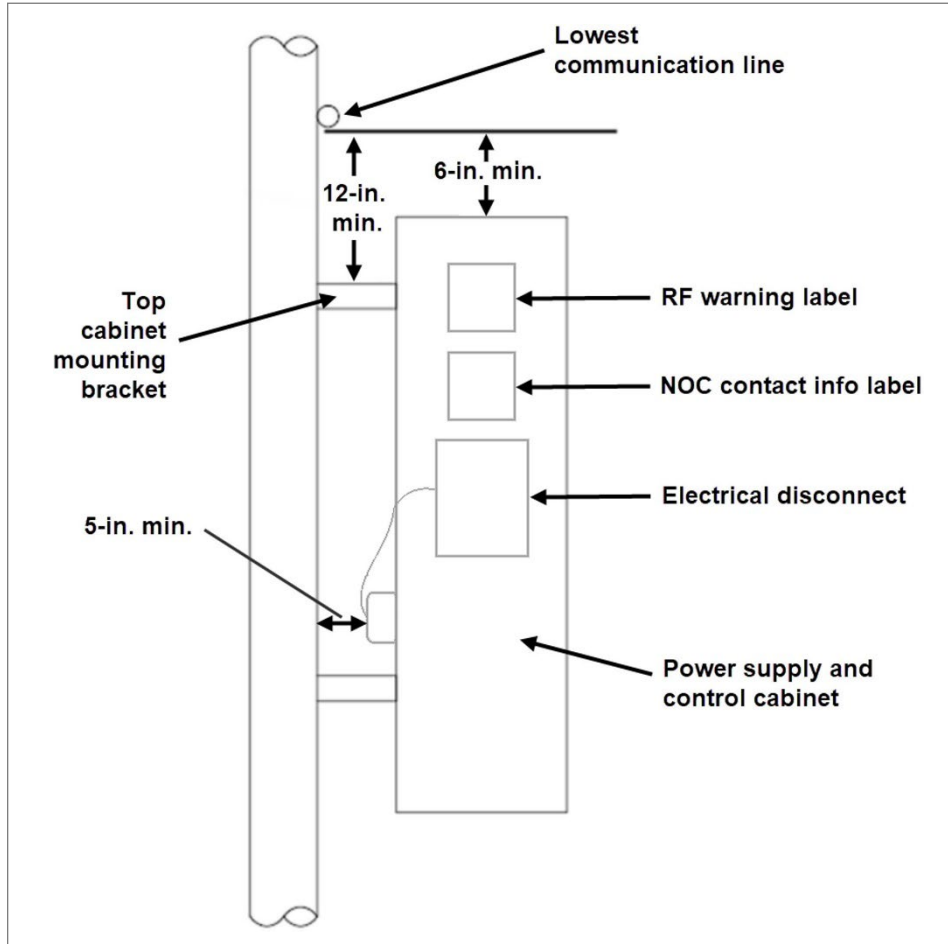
Clearances Between Equipment Cabinet and Lowest Communication Line
